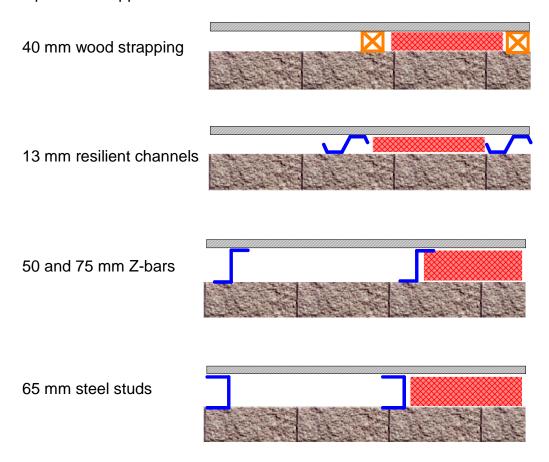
Techniques used to attach drywall to the block walls. In each case the walls were tested with and without glass fibre in the cavity.
